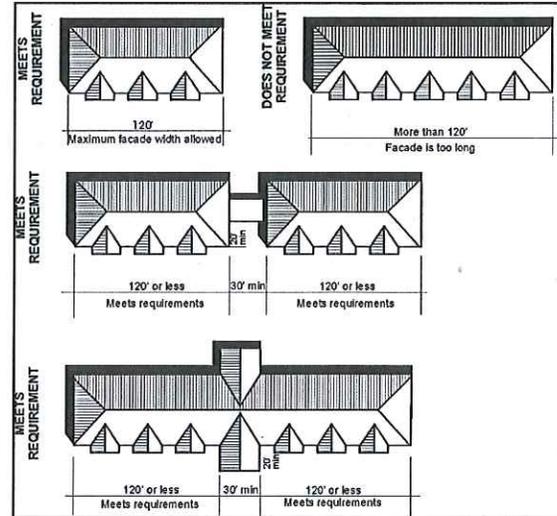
Acceptable methods to meet building modulation (dimensions in text prevail).
